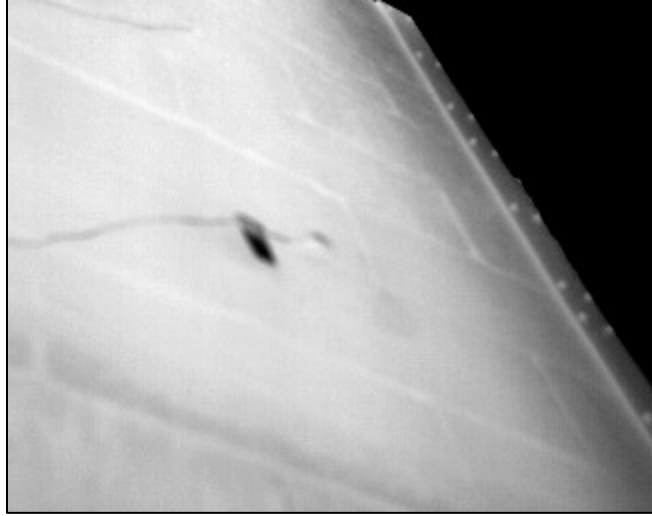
Thermal Image Location 6 1:19 PM (North Side of Wall 2)
